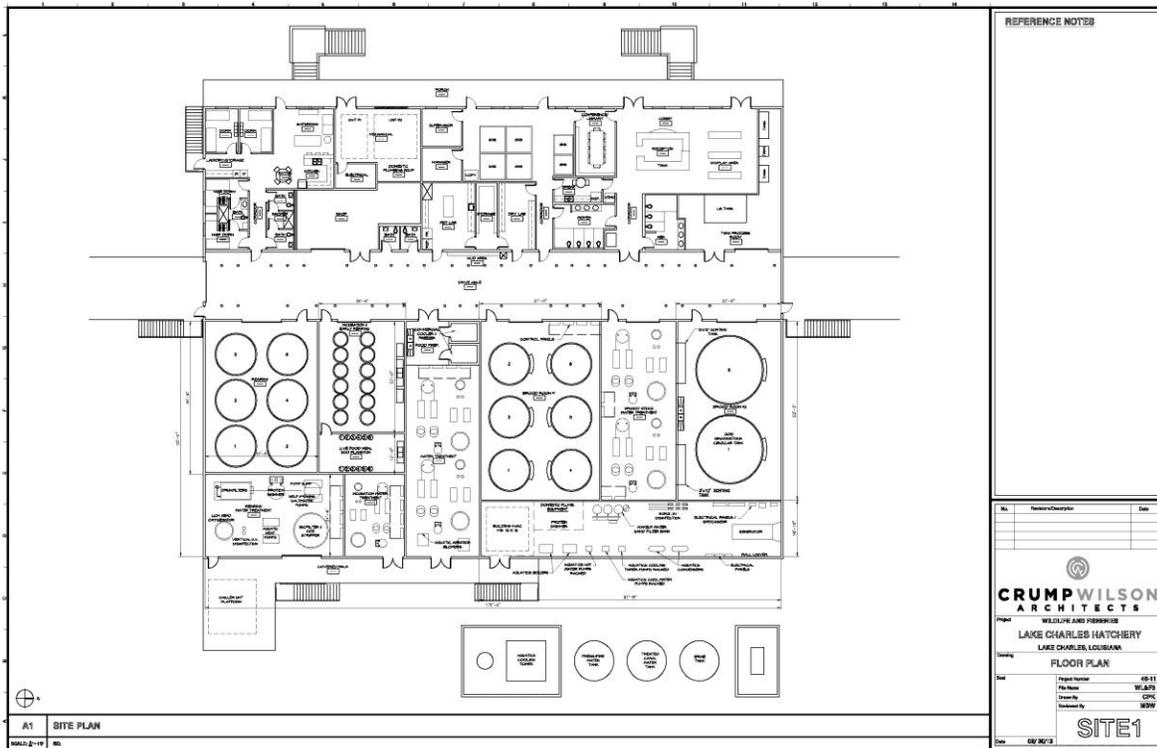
Proposed floor plan for Calcasieu Parish multi-purpose building.
